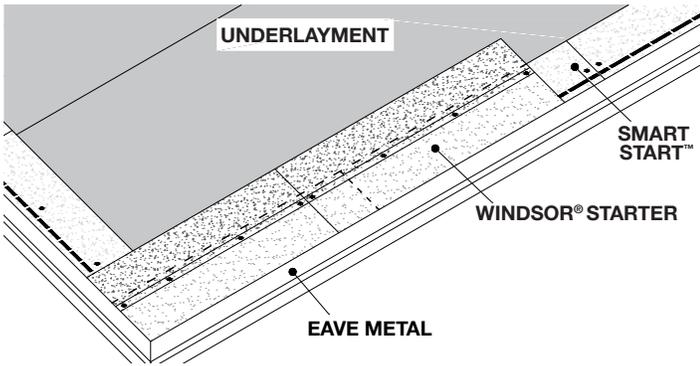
Application of Windsor® Starter Shingles over Smart Start® at the Eave Edge of Roof
